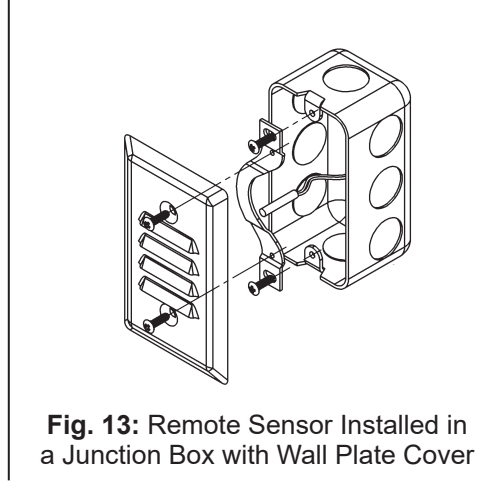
Remote Sensor Installed in a Junction Box with Wall Plate Cover
